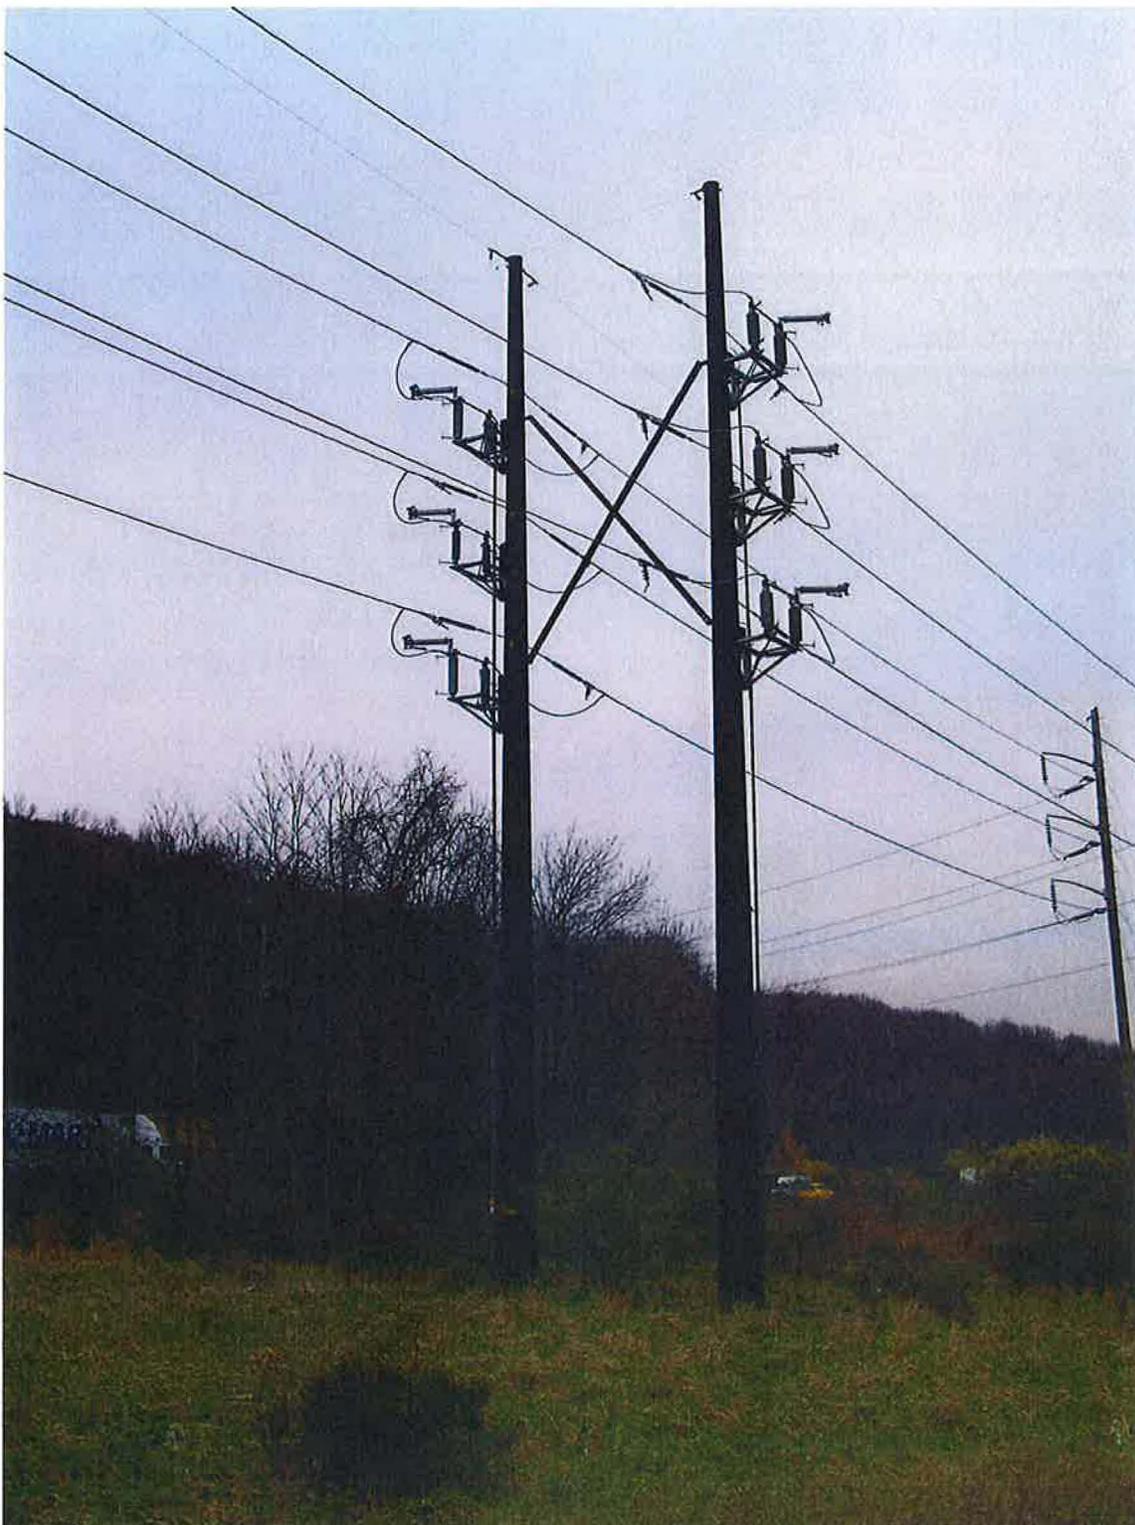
138/69 kV LOAD SECTIONALIZING AIR BREAK SWITCH (LSAB), SHOWN AS FUTURE CONFIGURATION
